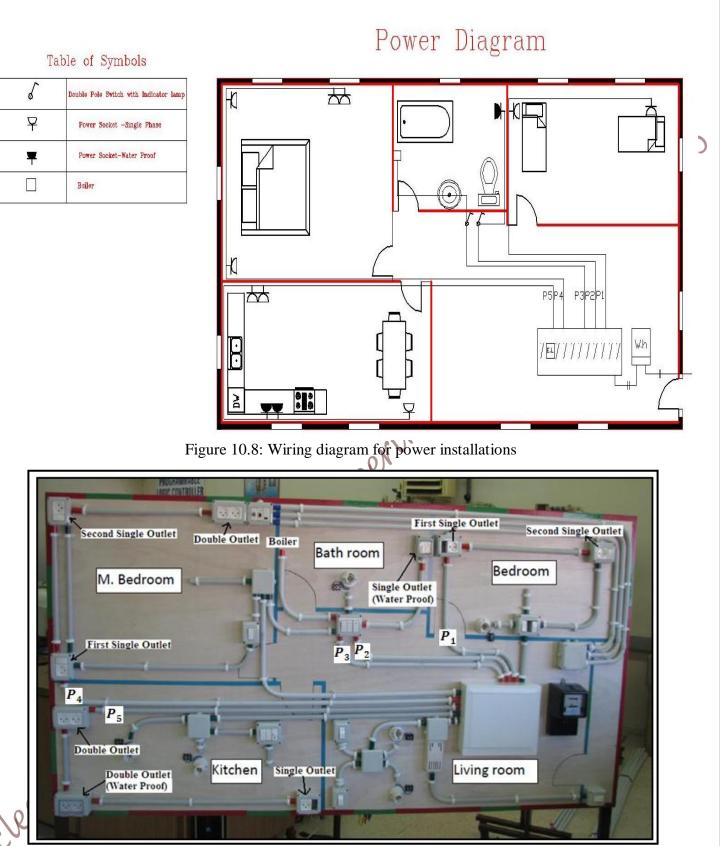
A photo of conduits, installations, and wiring in a symbolic flat consisting of a living room, a bedroom, a master bedroom, a bathroom and a kitchen
